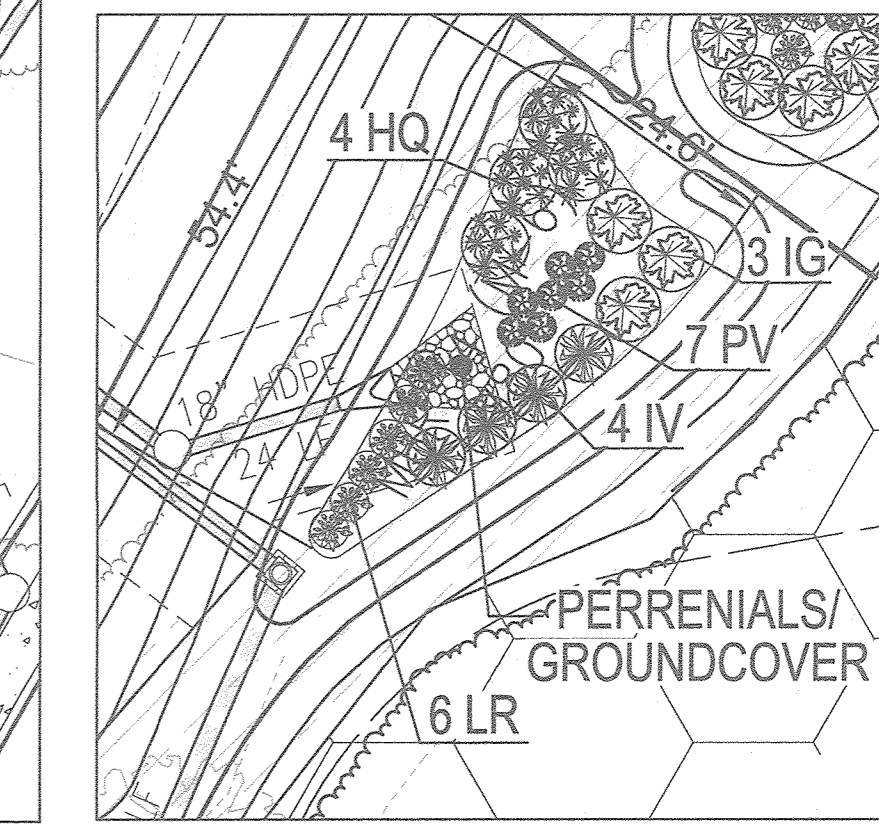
DETAILED BIO AND PLANTING PLAN (SWM #11)
